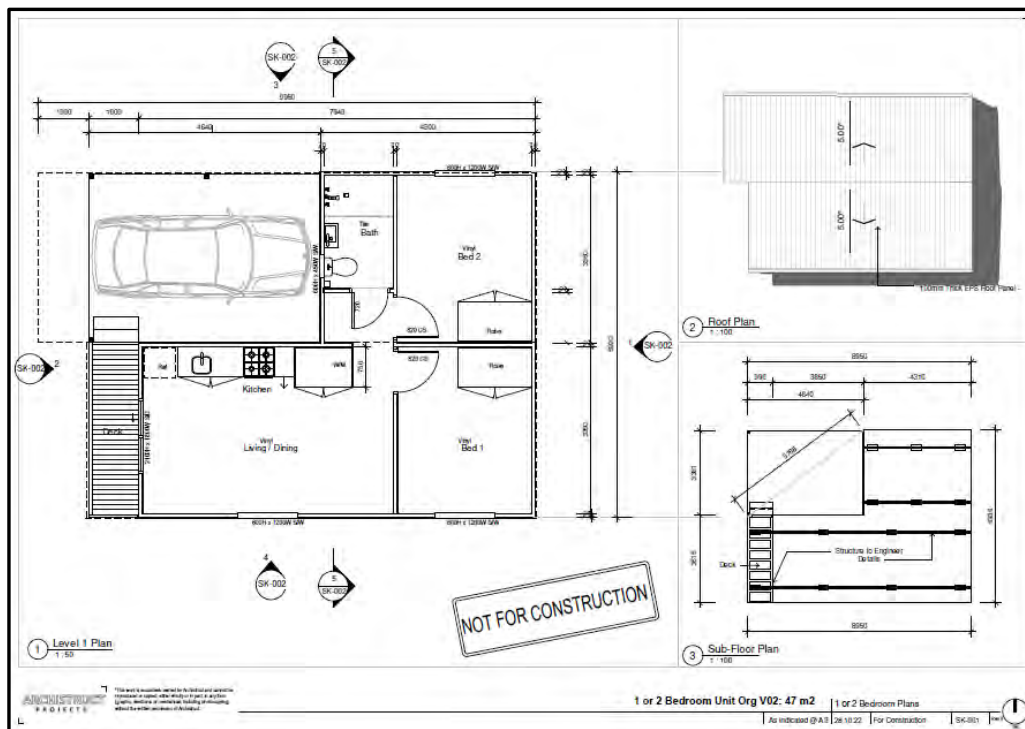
Proposed Unit Floor Plan. Source: Applicants submission
